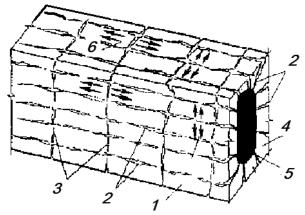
Concrete shrinkage: 1 - part of concrete beam; 2, 3 - longitudinal and transverse shrinkage cracks; <math>4 - the outer surface; 5 - the inner part; 6 - the tensile stresses
